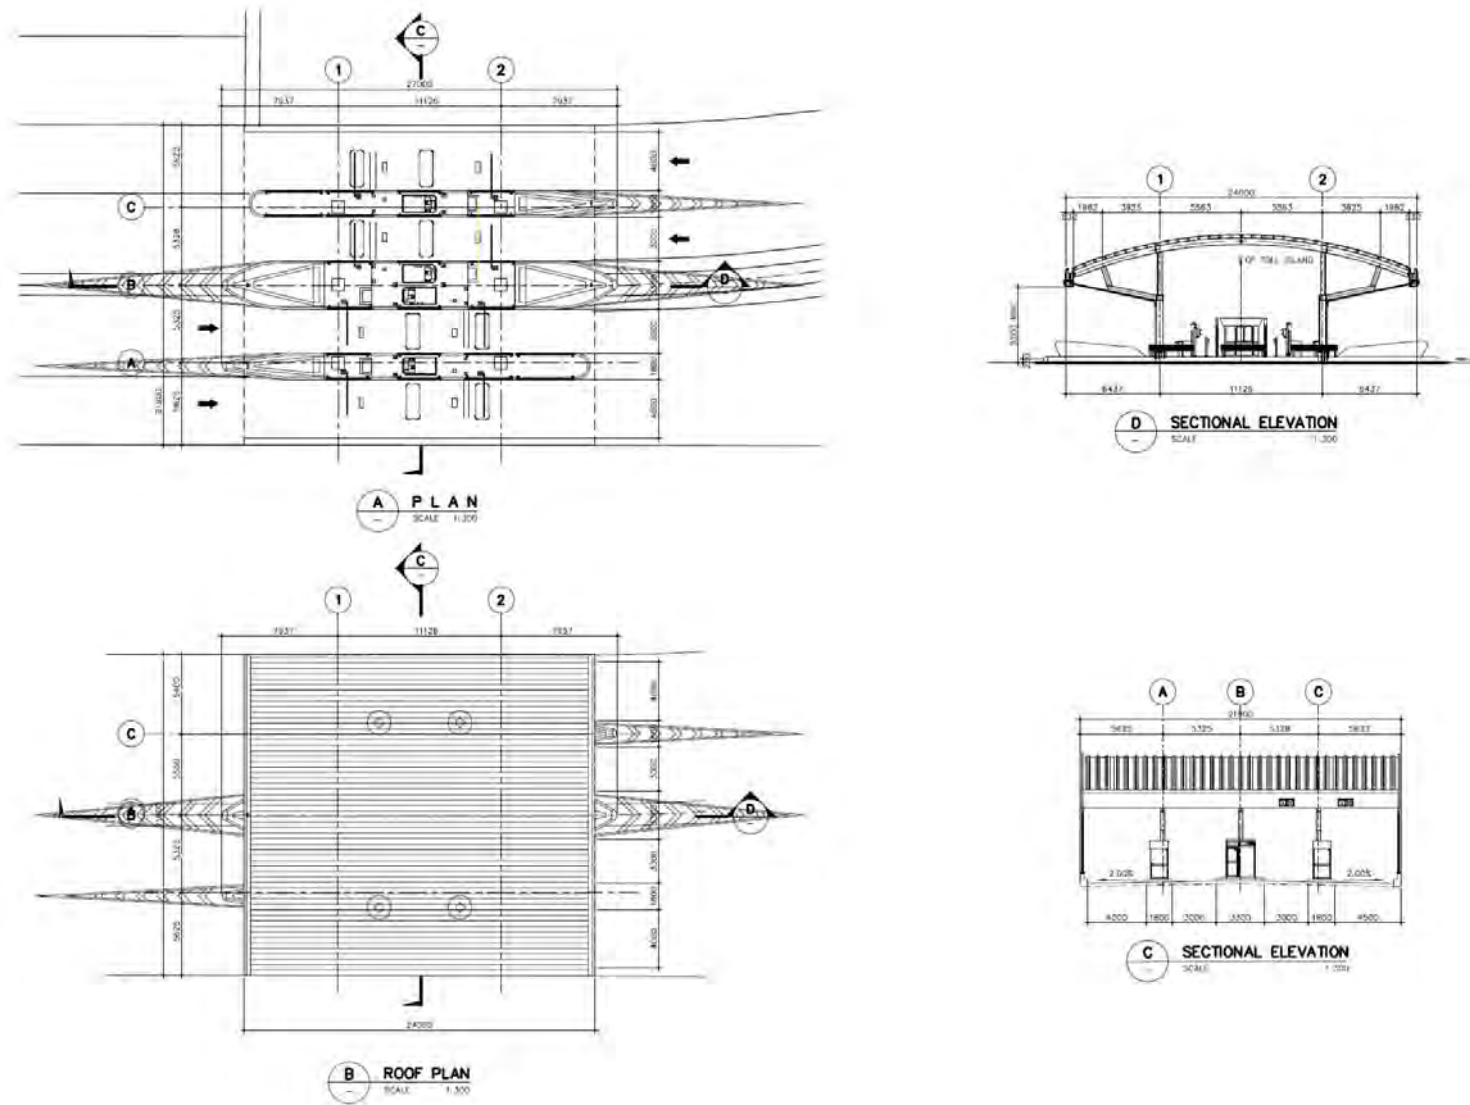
(3) TYPICAL DRAWING OF TOLL BOOTH LAYOUT (3BOOTHS)
